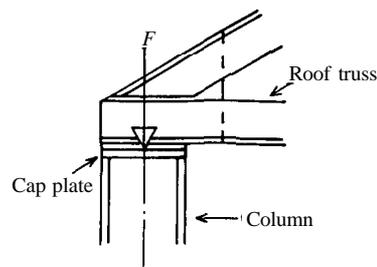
Column supporting a roof truss, the load from which is transmitted concentrically
